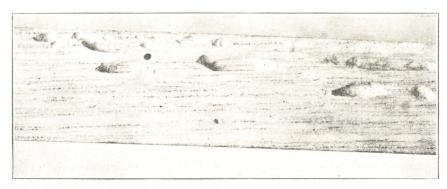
Work of powder-post beetles in flooring cut to show tunnels, enlarged about 2 x
